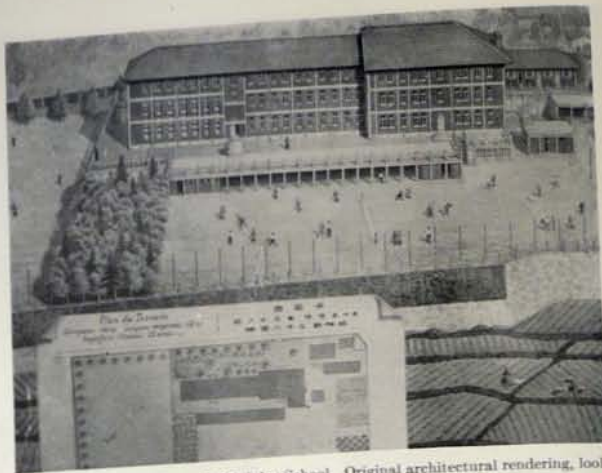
4,800 feet from GZ. Group 7, Divinity School. Original architectural rendering, looking northwest.
